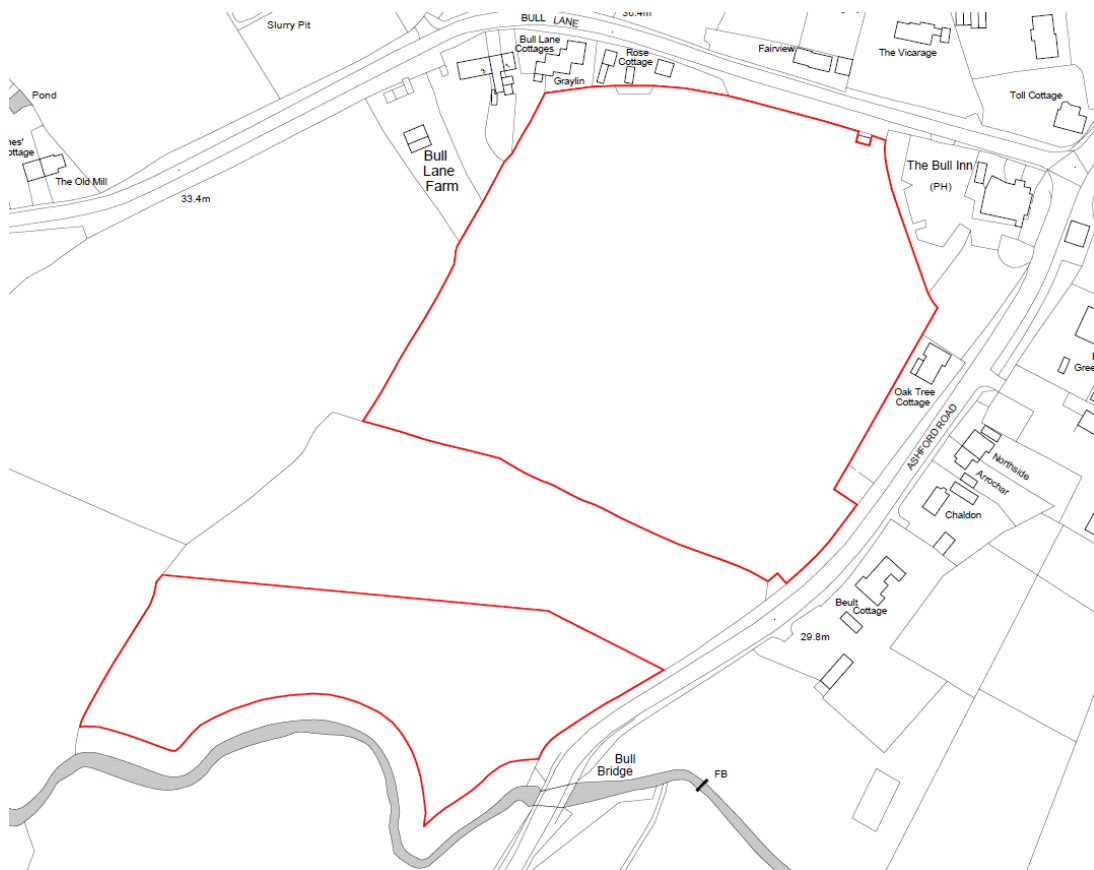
SITE LOCATION PLAN (ON ARCHITECTURE)
